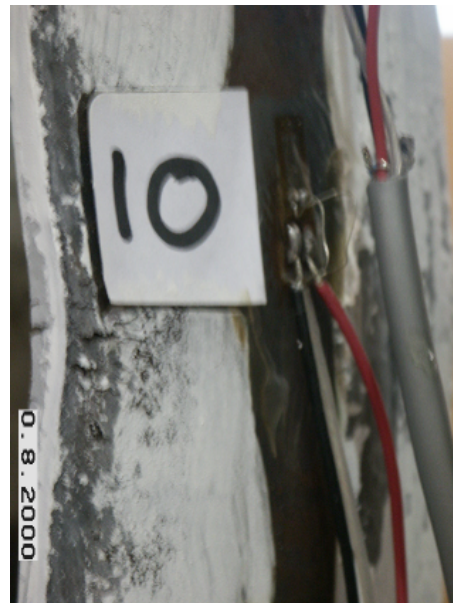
Cyclic Loading, Load Step # 12, Fatigue Failure.
